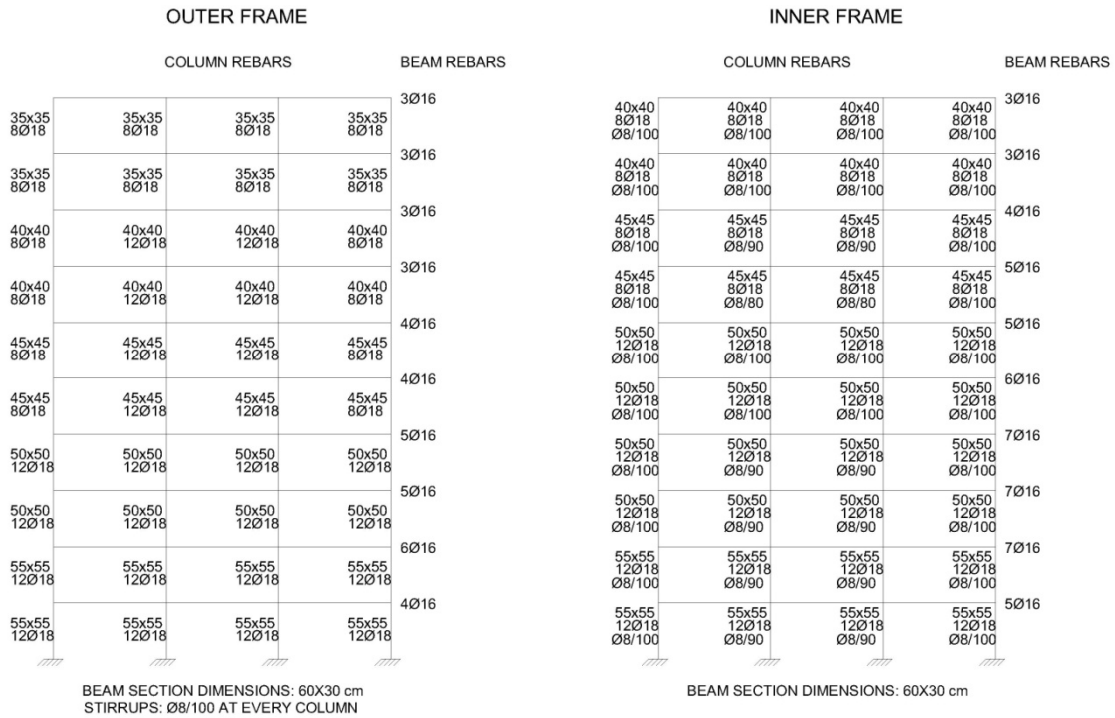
Section dimensions and detailing of the Ten-Storey Frame R.
